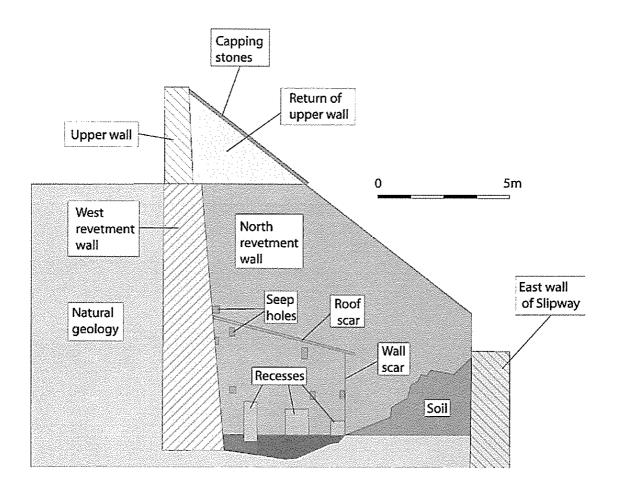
Elevation of the northern revetment wall. NB.Horizontal distances are measured, but vertical distances are estimated. The width of walls in section are not known
